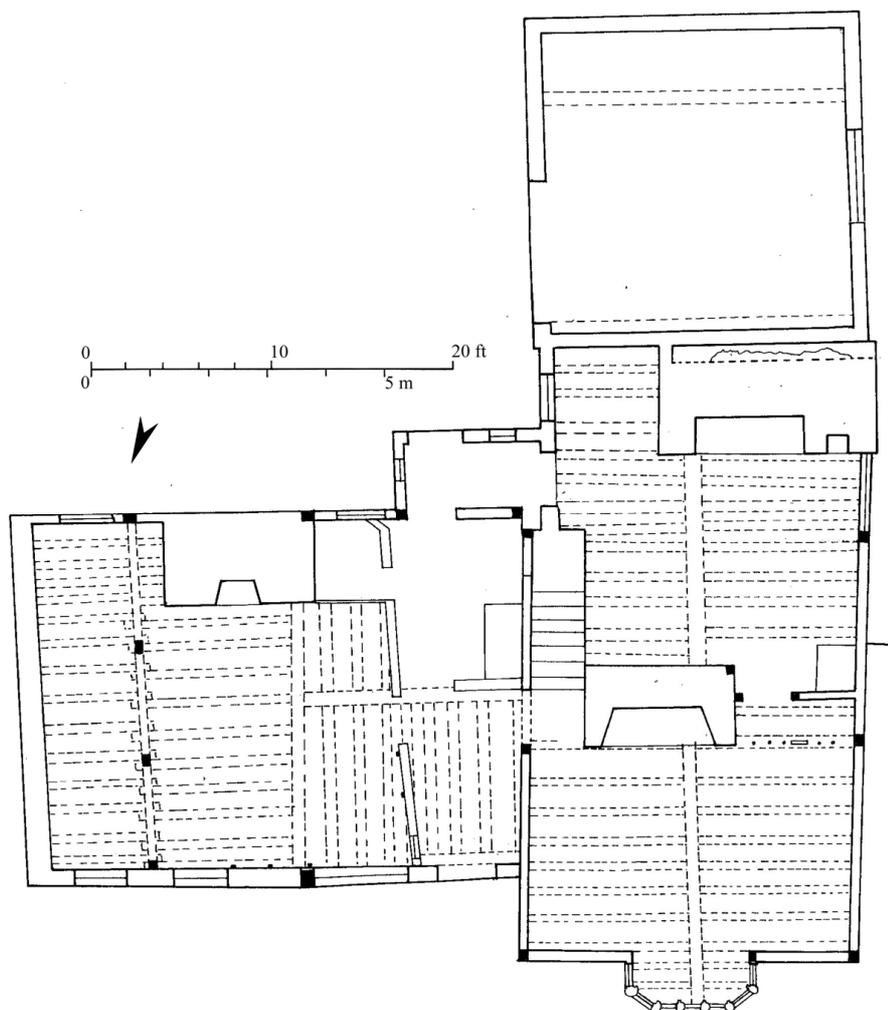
Ground floor plan of Tudor House: detailed plan with joist and beam positions (OBR).
